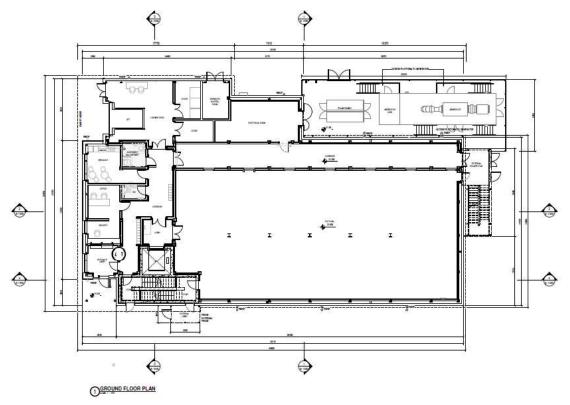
Proposed Ground Floorplans (please note – a larger version of plan can be found in the Committee Plan Pack)
